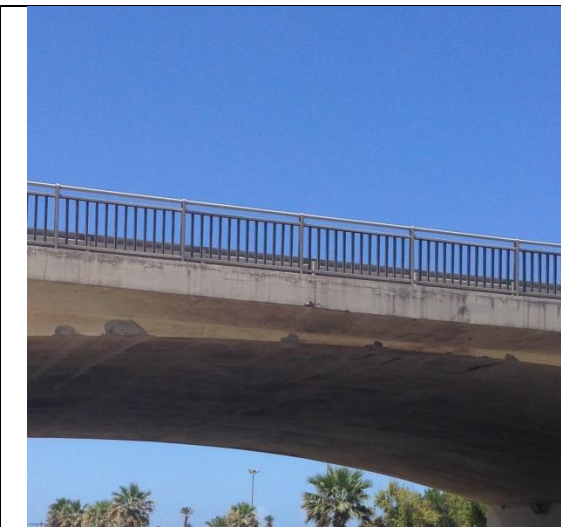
A View of lateral beam of arch slab and cantilever slab, east side.
